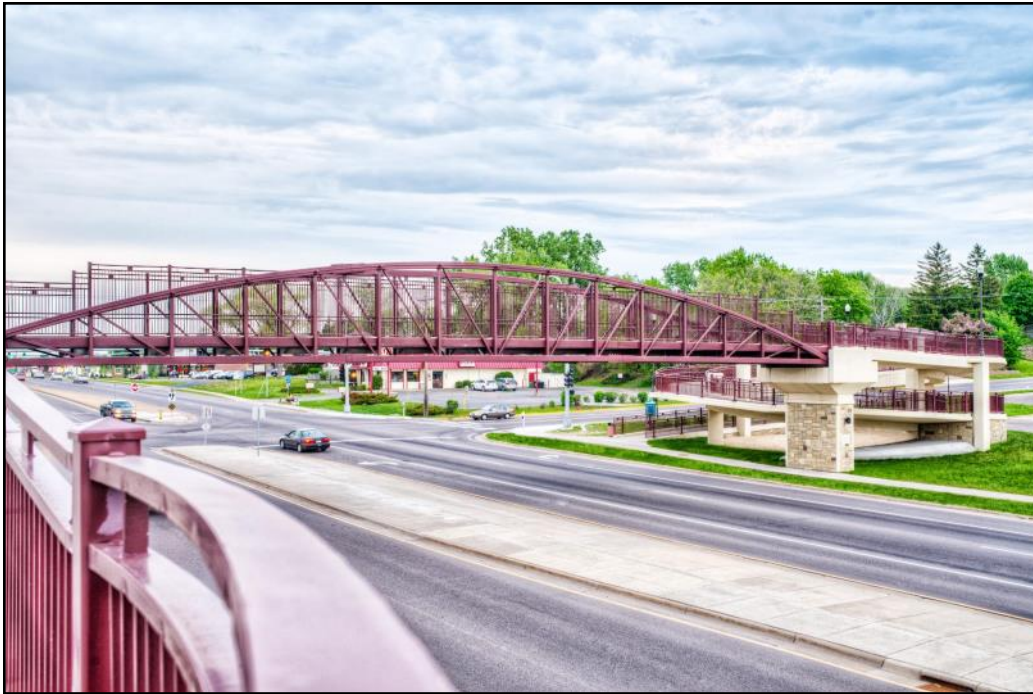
Pedestrian bridge with accessible switchback ramps in Columbia Heights, Minnesota. Photo courtesy of C.S. McCrossan
